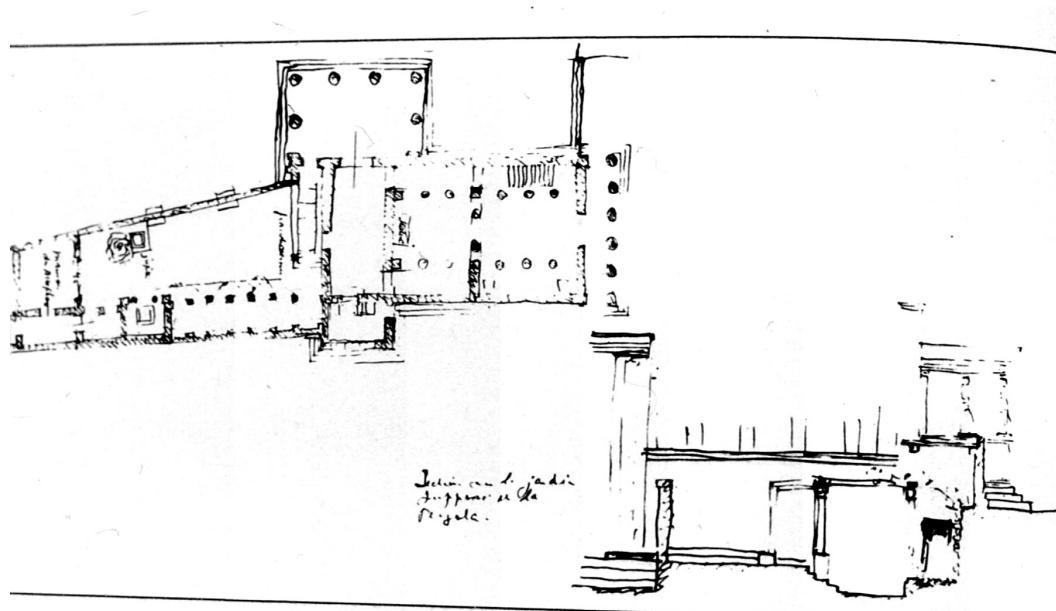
LC - Erechtheion, plan and cross-section (with elevation). Ink on separate undated sheet. Berlin 1910?
